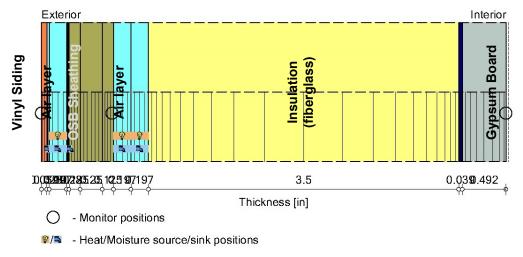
WUFI cross section (Round 1, Wall 3) showing ventilation air spaces
